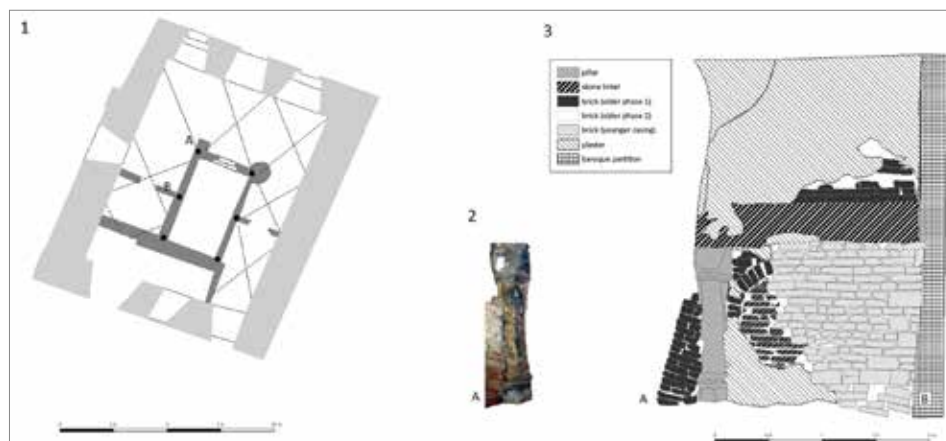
Brtnice Château – the kitchen. 1 – detail of the kitchen schema with a central flue over six pillars; 2 – stone pillar (position A); 3 – south-western view of the walled-in flue.
